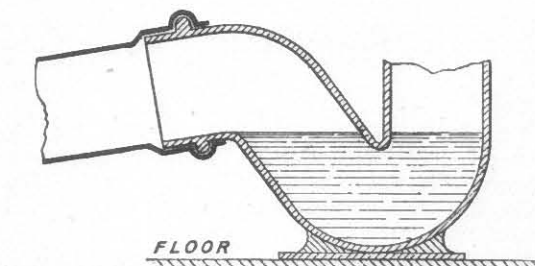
Improved Socketed Joint between Earthenware Trap and Lead Soil-pipe.
